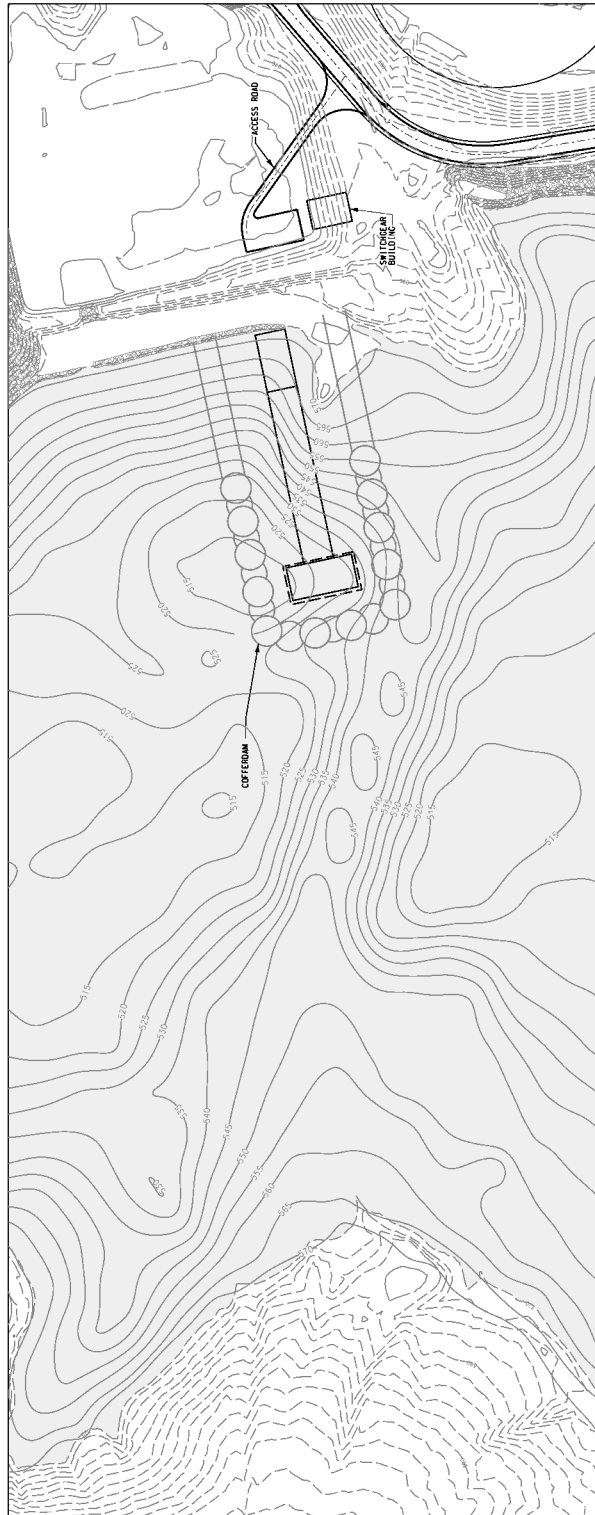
Planned Configuration of the Make-Up Pond B Intake Structure and Access Pier (Duke 2012h)
